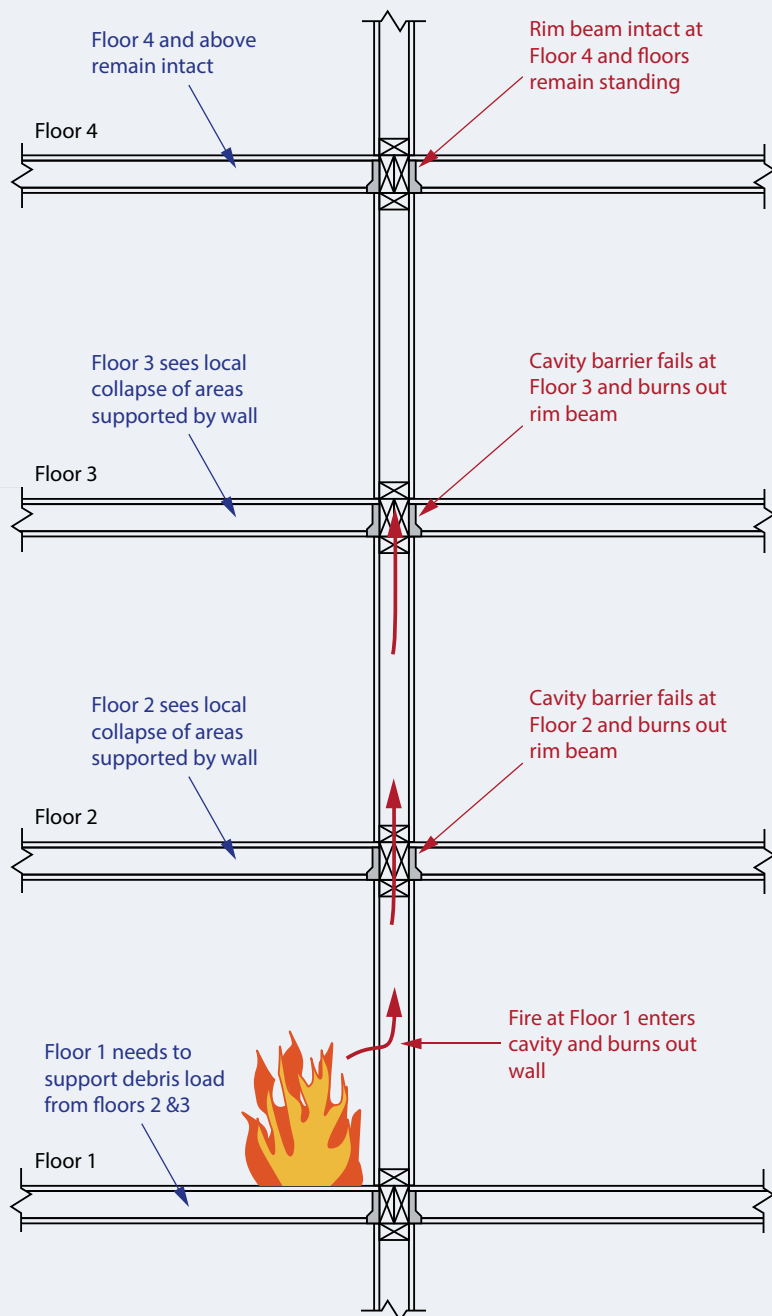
Loss of two storeys of loadbearing walls in a loadbearing timber stick-framed building.
